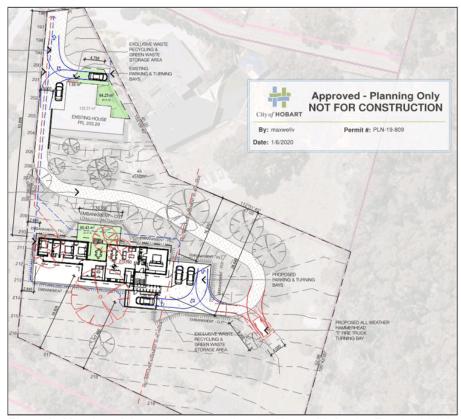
Site plan of the under construction dwelling at 32 Copley Road, which is the neighbouring to the east of the subject site.
